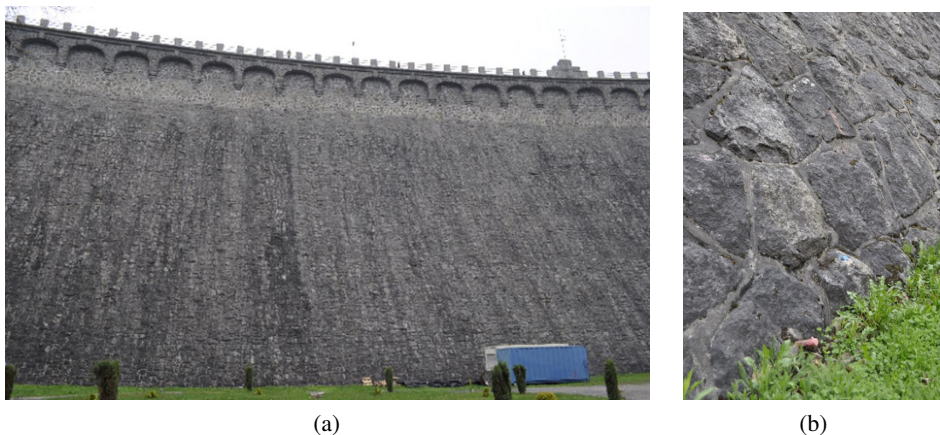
Pilchowice dam wall: a) view of the wall with a visible ledge at the crown, b) surface structure of the wall
